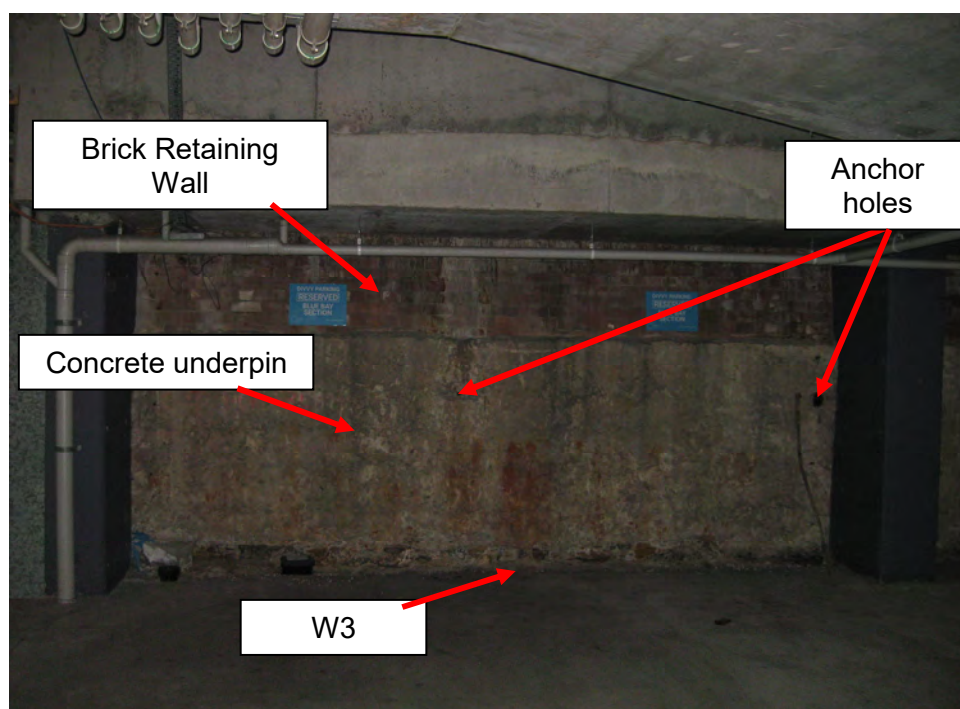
View south-east within the Adina Hotel basement towards the western site boundary, the lower part of a brick retaining wall and a concrete underpin. The location of boreholes W3 and holes for former temporary anchors are indicated as shown.
